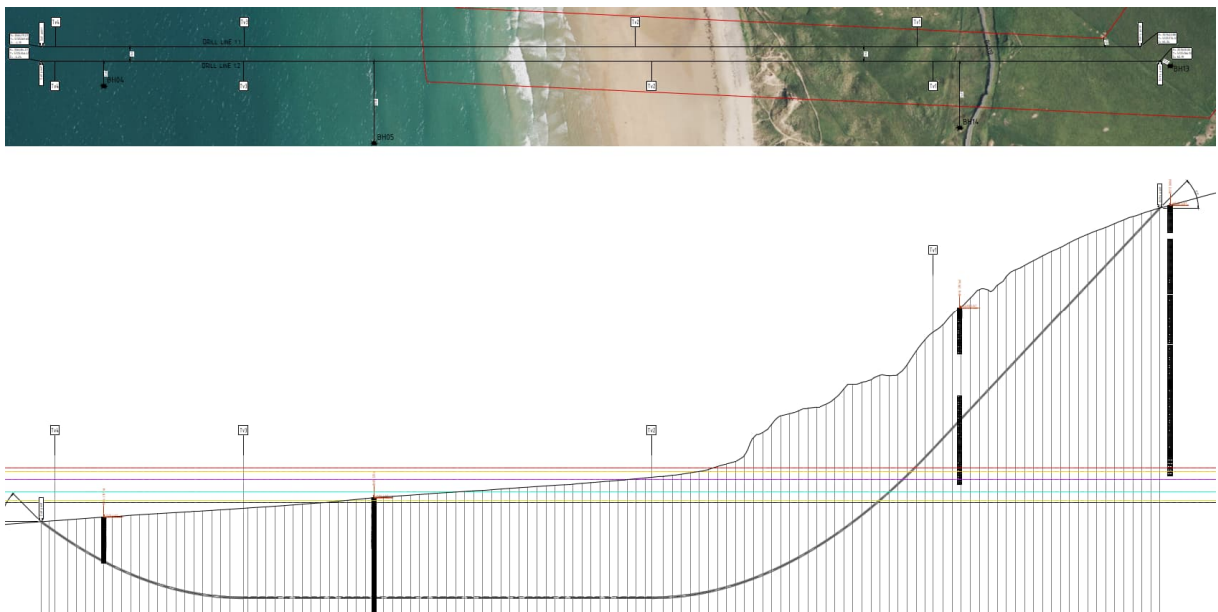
detailed location of asset trajectory to be installed underneath the beach.
